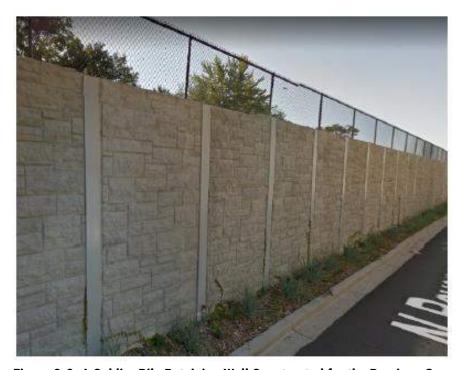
A Soldier Pile Retaining Wall Constructed for the Previous Grace to Balmoral Project
